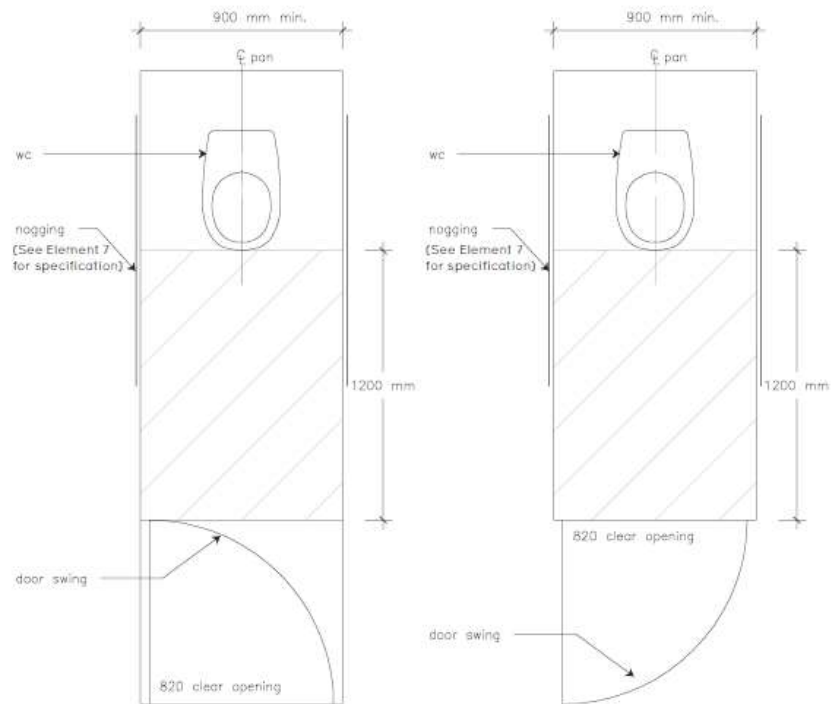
(a) Silver level ground (or entry) level toilet layout and space requirements in a separate room.
